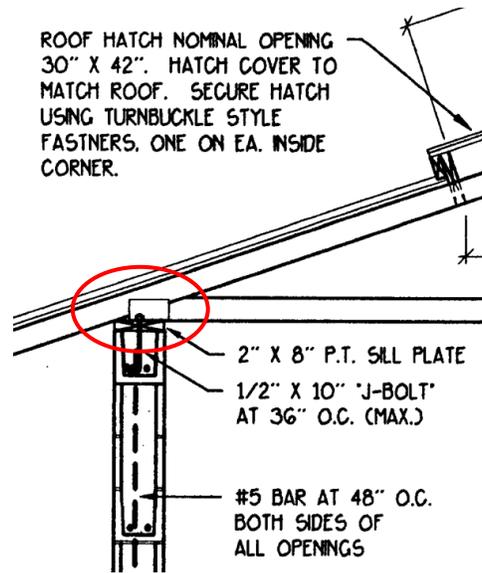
Inadequate Wall Out-of-Plane Anchorage Connection
